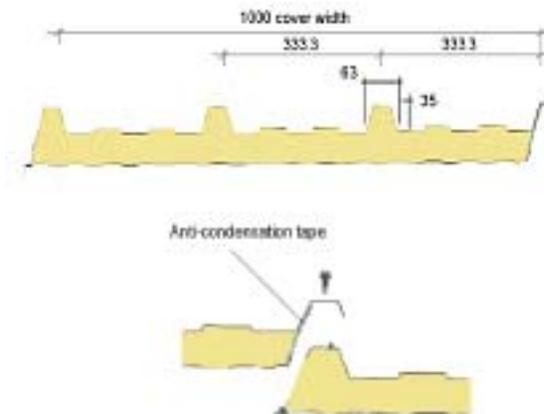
Shows RW Trapezoidal type profile and joint detail. For notes on thickness see 6.8.
